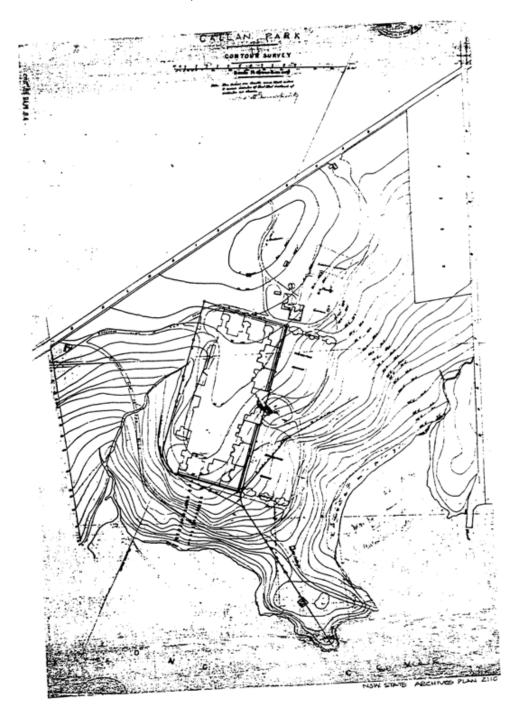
Callan Park Asylum - as proposed – 1877. The layout differs from the 1893 as-built plan Source: DPWS 1991
